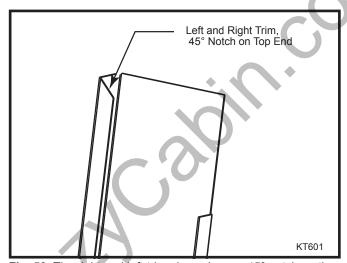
The right and left trim pieces have a 45° notch on the back corner of the top end when properly installed.
